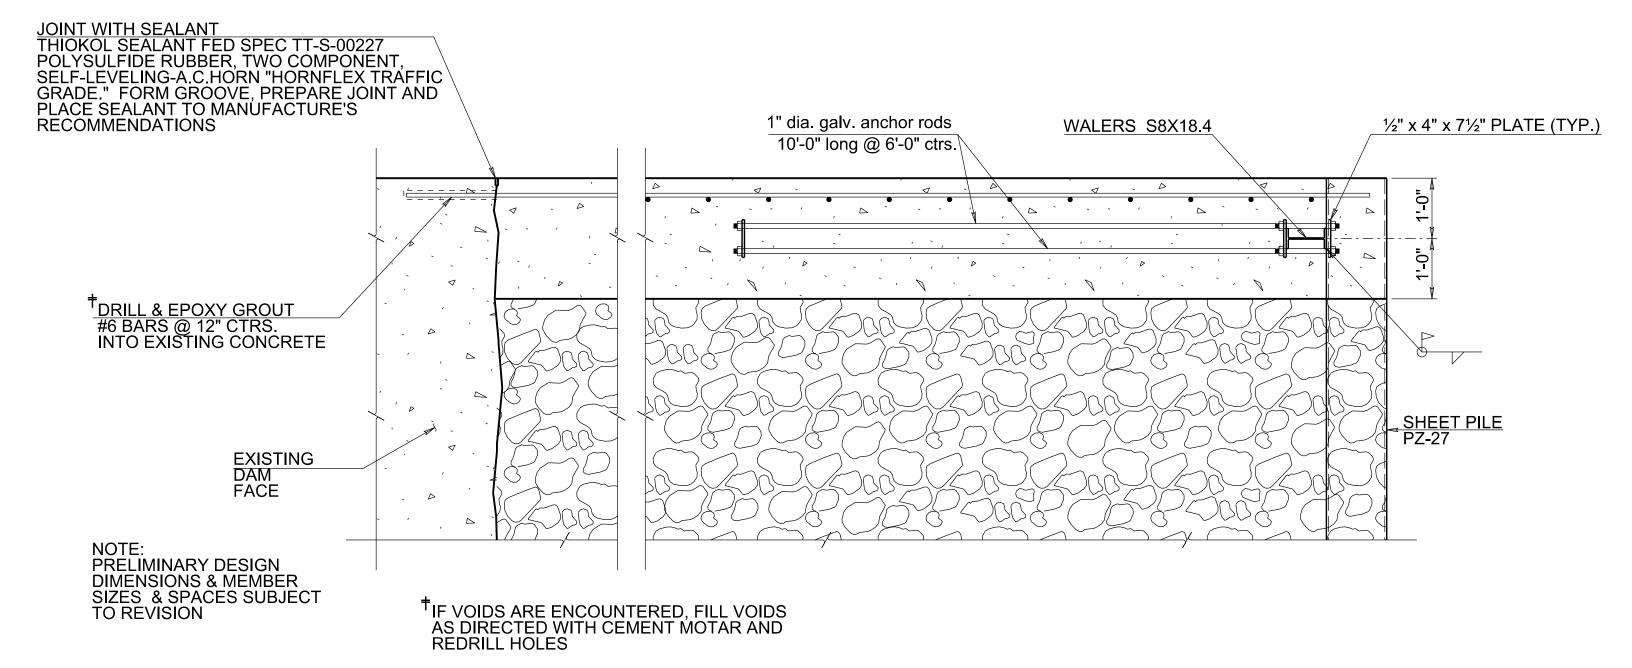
SHEET PILING DETAIL (SECTION A-A)
